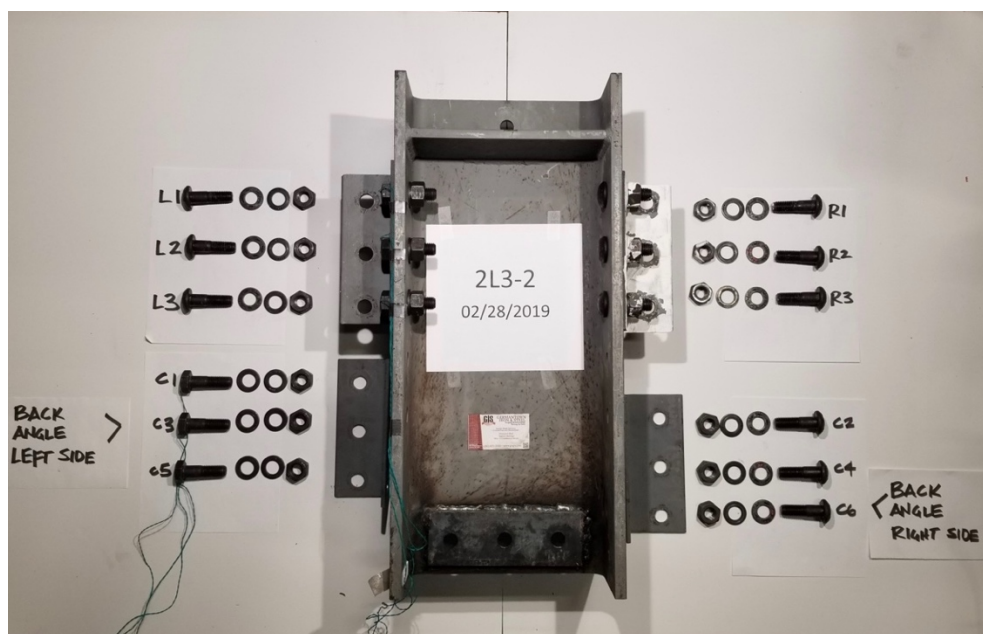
Typical post-test layout of 2L3 series specimen.
